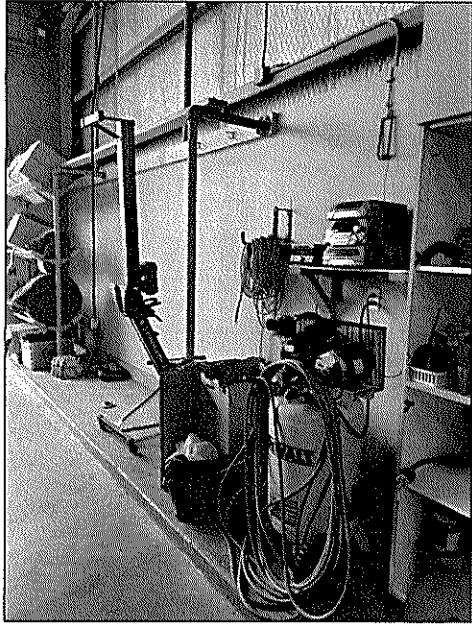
FIRE DEPARTMENT SHALL REMOVE SECTION OF EXISTING FIRE HOSE RACK. CONTRACTOR SHALL INSTALL (10) WALL MOUNT LOCKERS.
